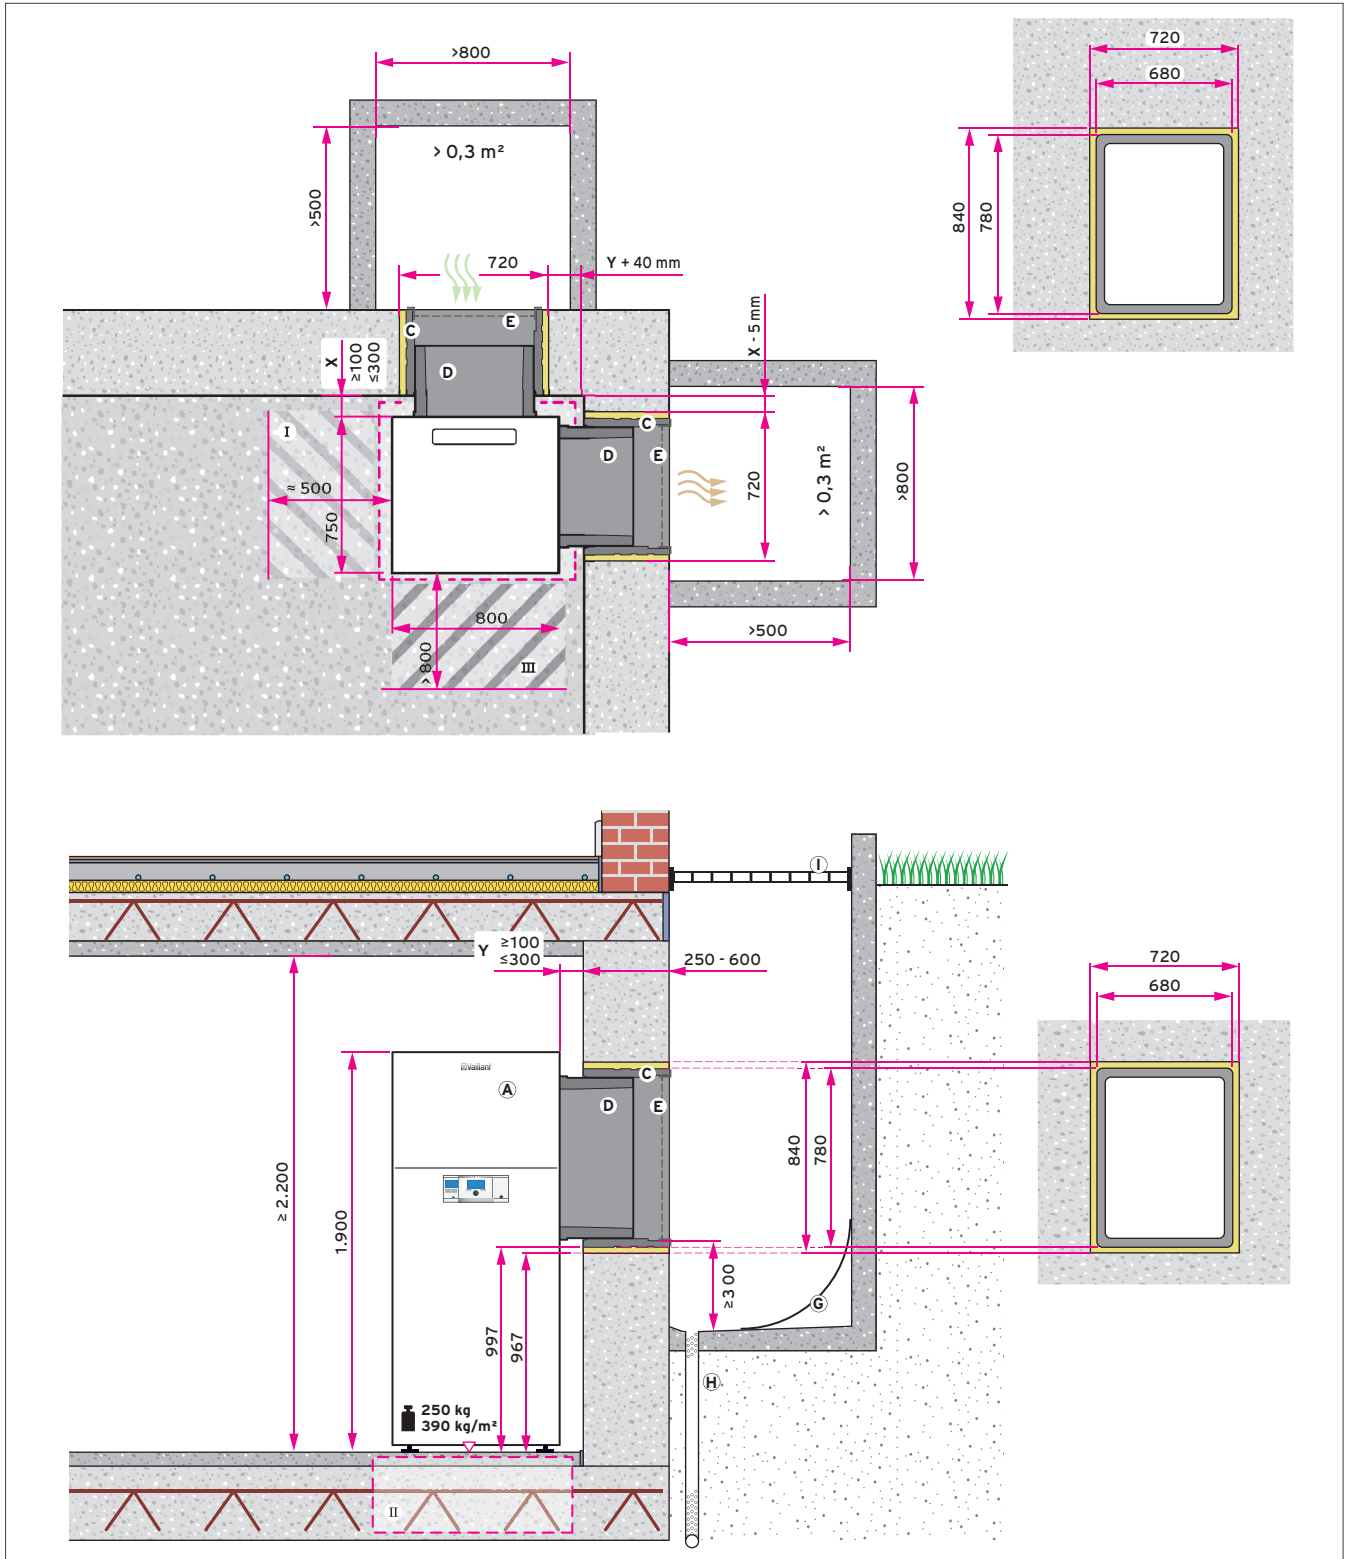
versoTHERM installation situation, cellar - right-hand installation in the corner of a room, air supply via light wells
